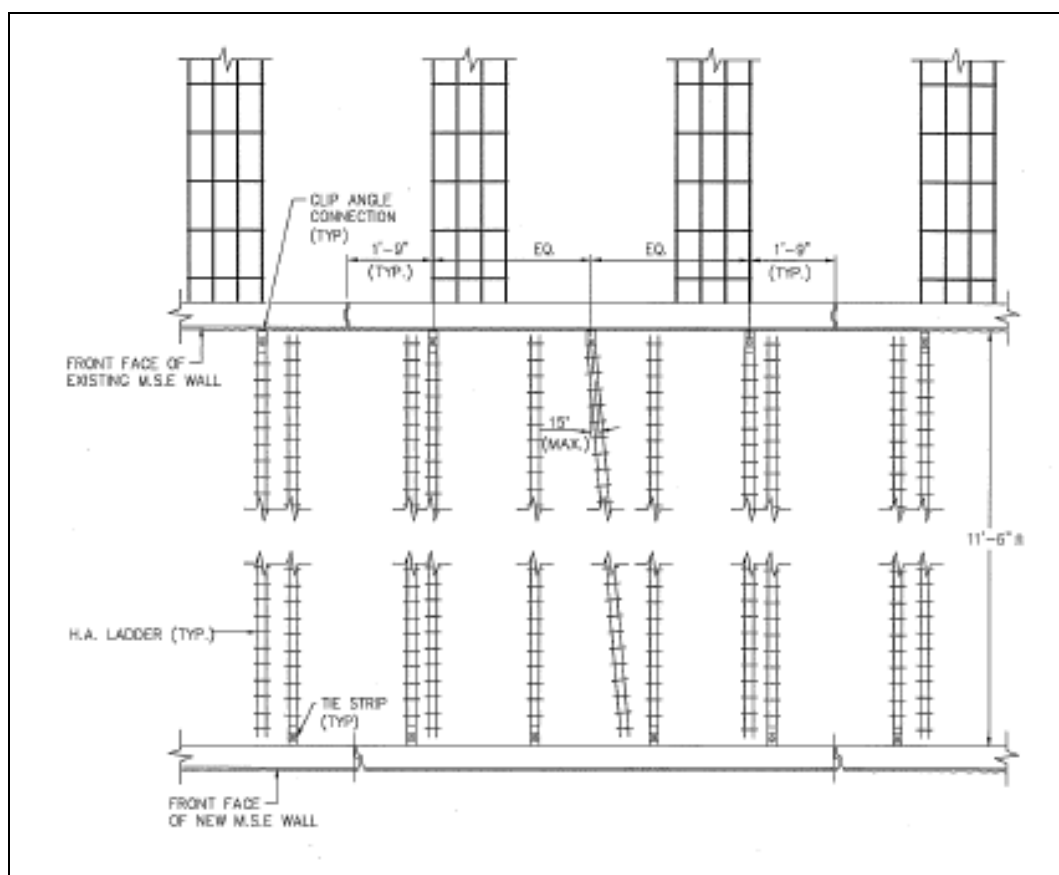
Layout of SREW section fronting steel grid-reinforced MSE wall
